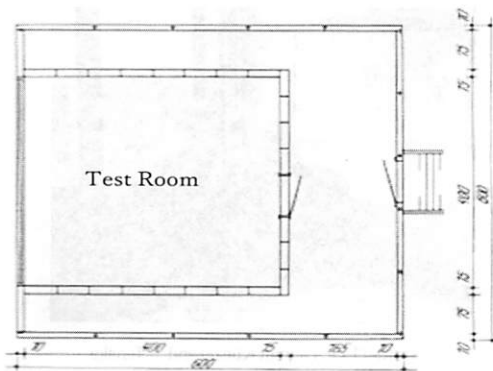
Plan of Revolving Type Colorimeter Test Room of Germany
